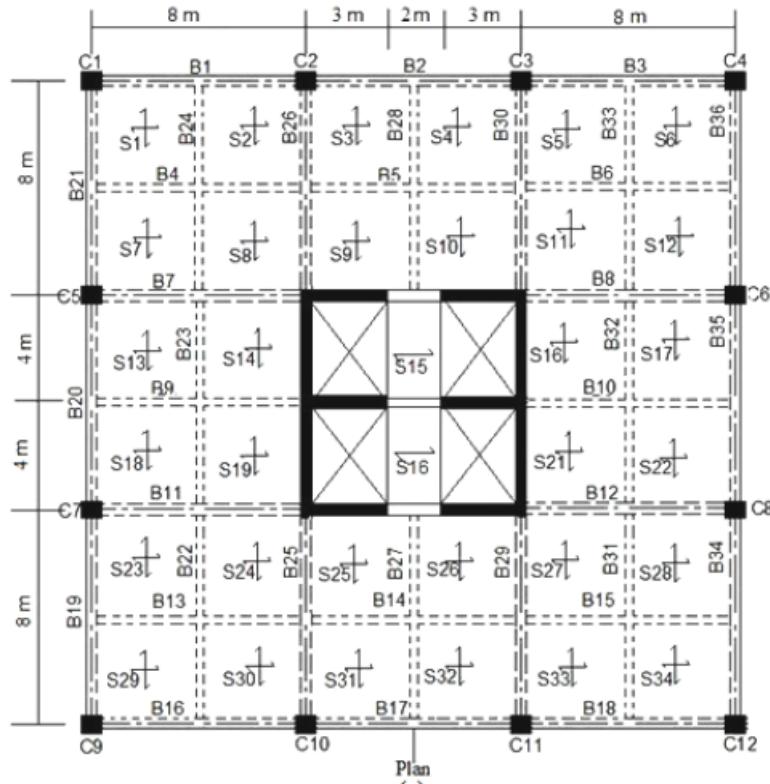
Detail of floor level plan.[Courtesy: Patel Jigneshkumar C., Study Of Outrigger Structural System For High Rise Building , M.tech Thesis.]
